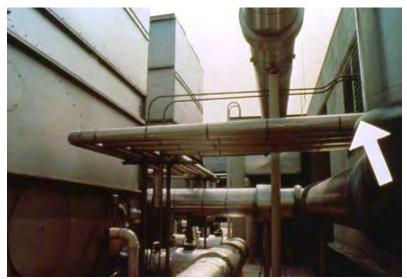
C HVAC Inlet Located within 13 ft (4 m) of a Double-Cell Cooling Tower *Photograph courtesy of Phil Morey.
